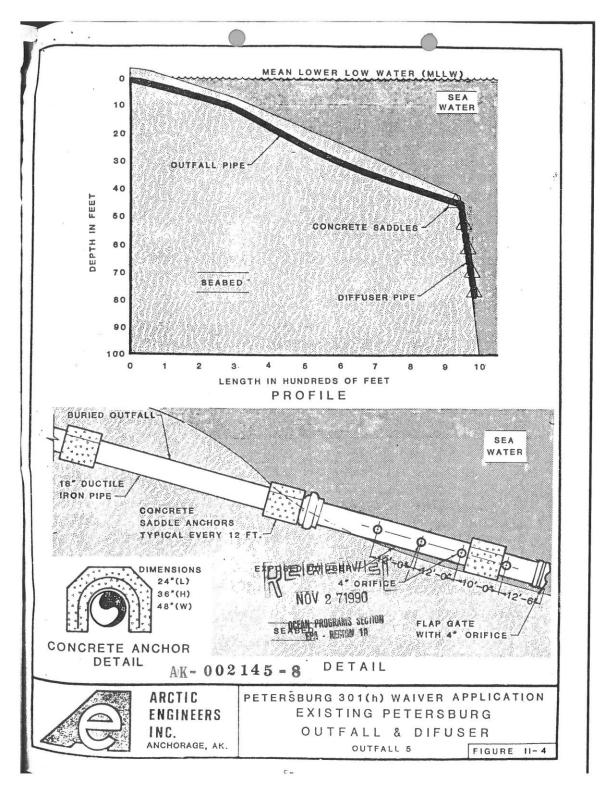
Petersburg Borough Sewer Outfall Plan View and Cross Section
